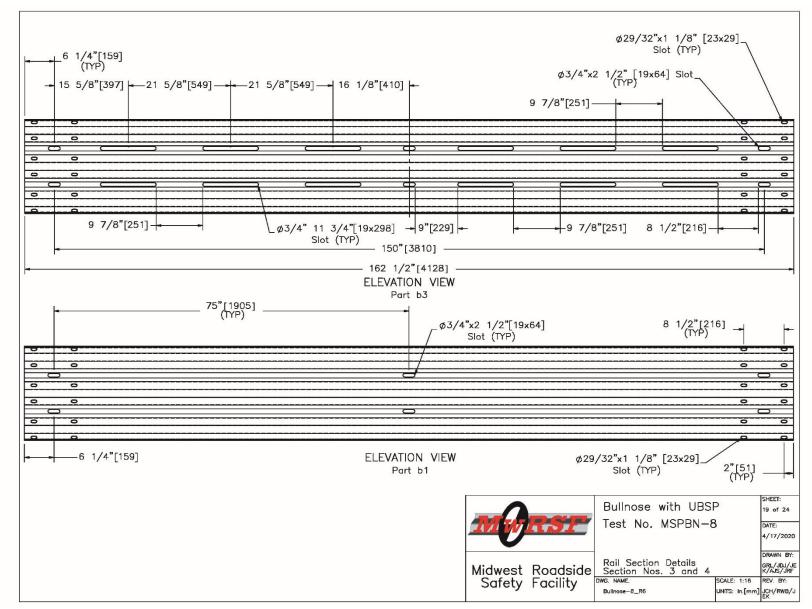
Rail Section Details, Section Nos. 3 and 4, Test No. MSPBN-8
